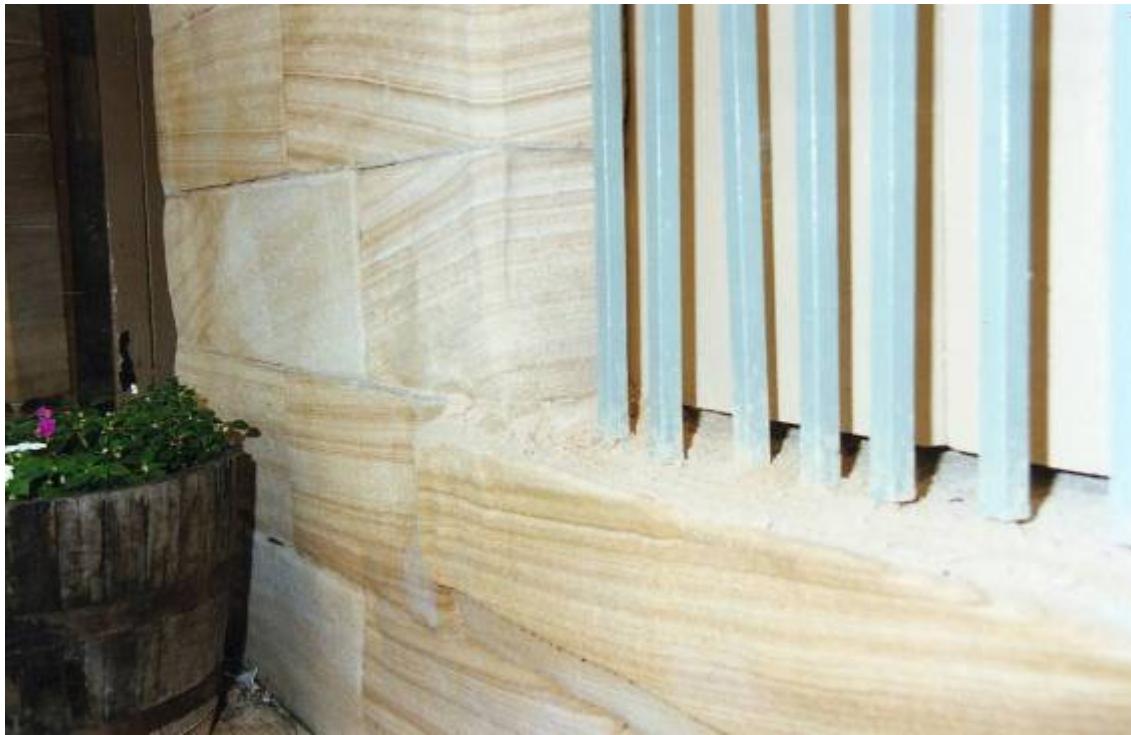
Bay 4, window sill and wall. The external wall that was re-skinned in the 1970s is now showing signs of rapid decay (1996).
